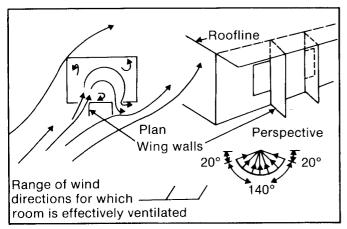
Good Ventilation Through Windows on One Wall When Wing Walls are Added
